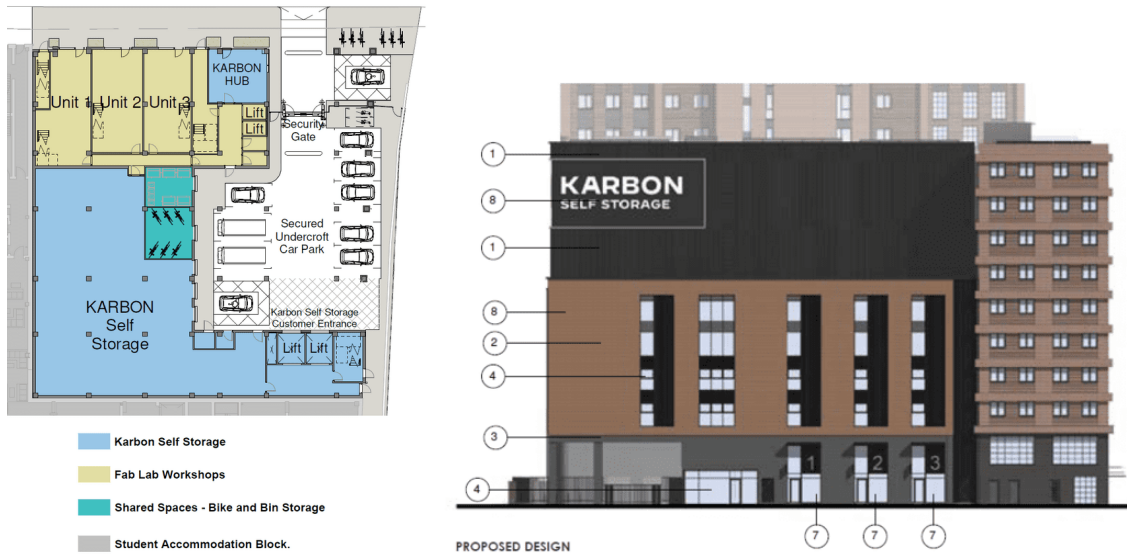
(from left) Ground floor plan of the commercial building; northern elevation of the commercial building
